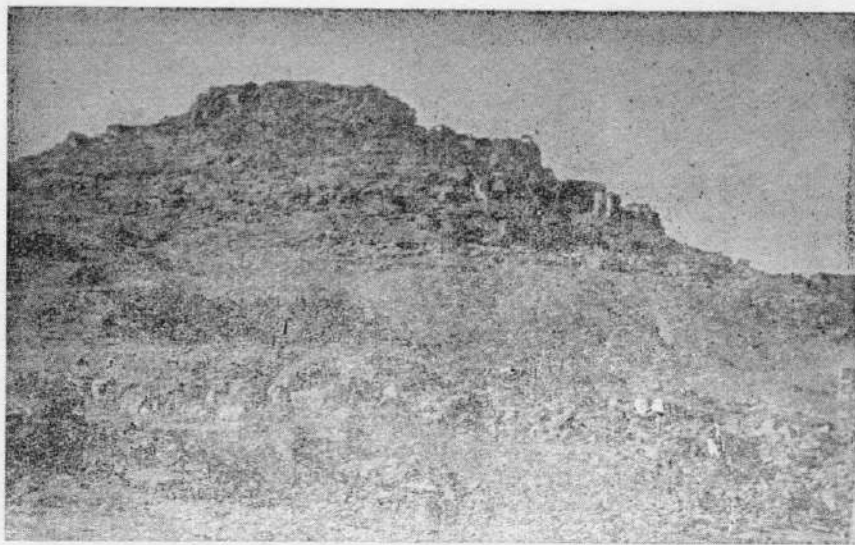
Complete destruction of all houses situated on hill top in Qubatil. The random stones littered all over the hill slopes.
